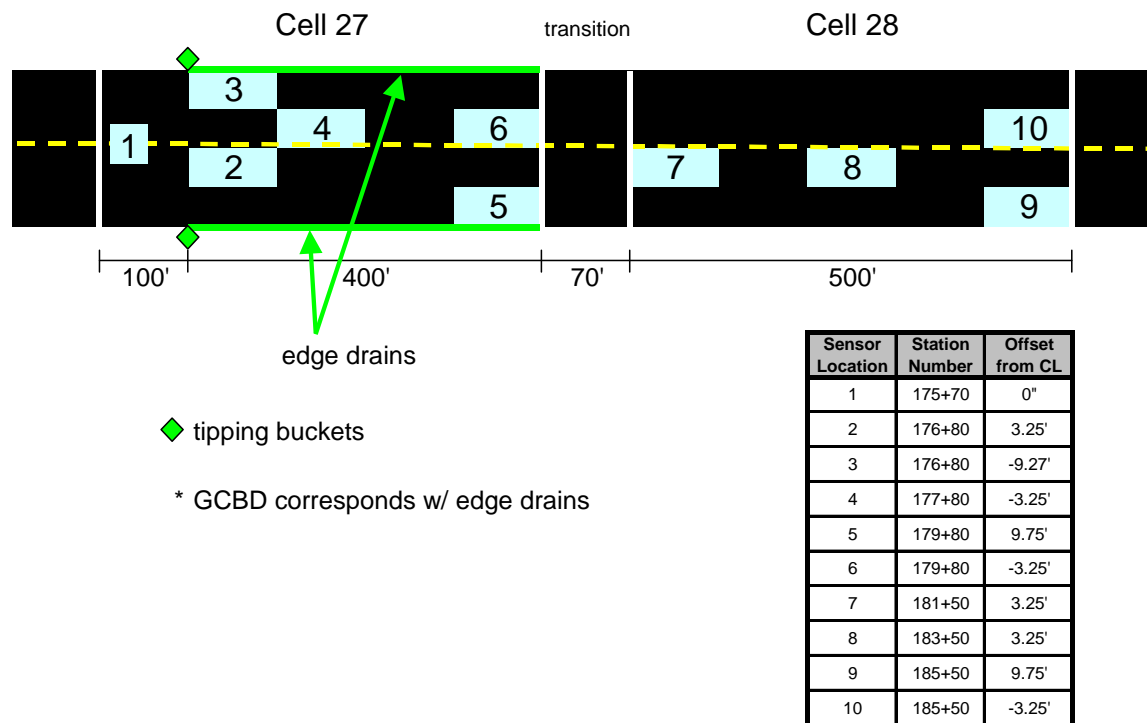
Plan view of MnROAD test cells and station locations.
